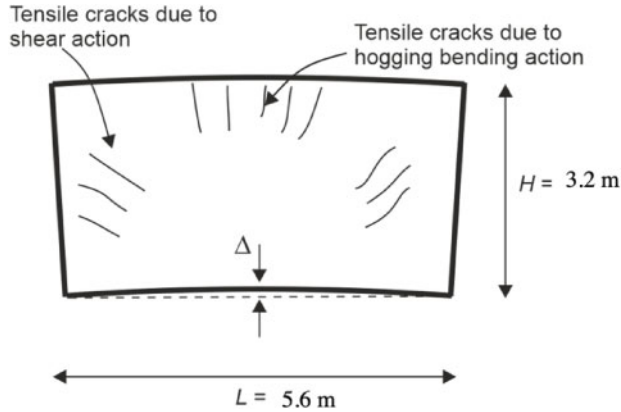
Assumed deformation mode and potential crack locations for elastic deep beam approximation of the building façade.
